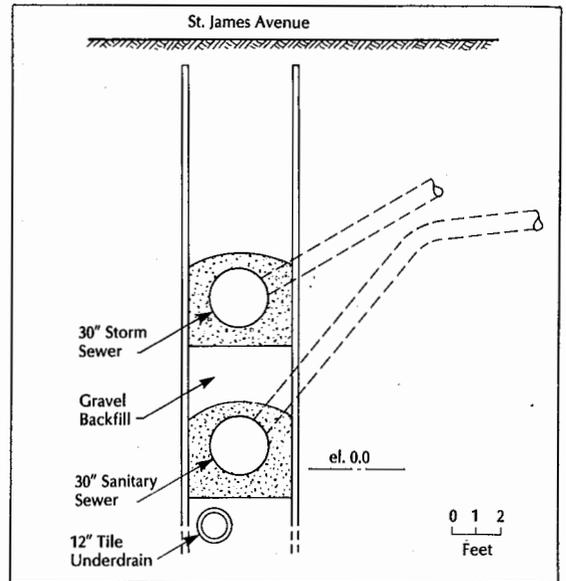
A typical cross section of the St. James Avenue sewer.
